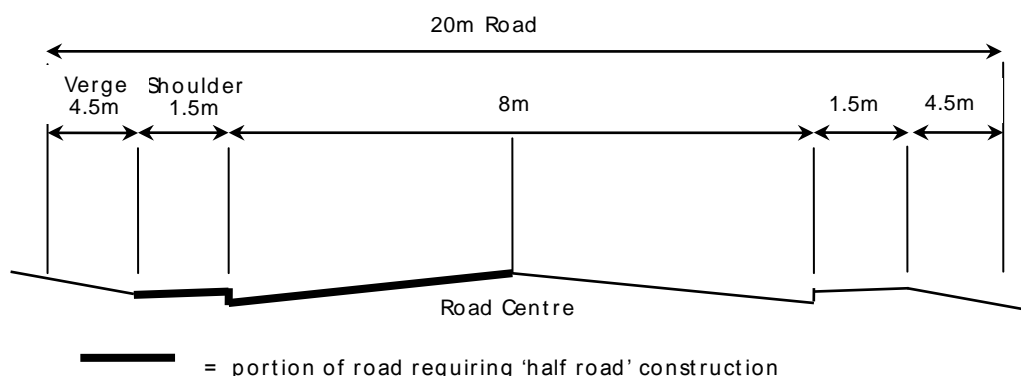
Half Road Construction for Subdivision in the R2 zone
